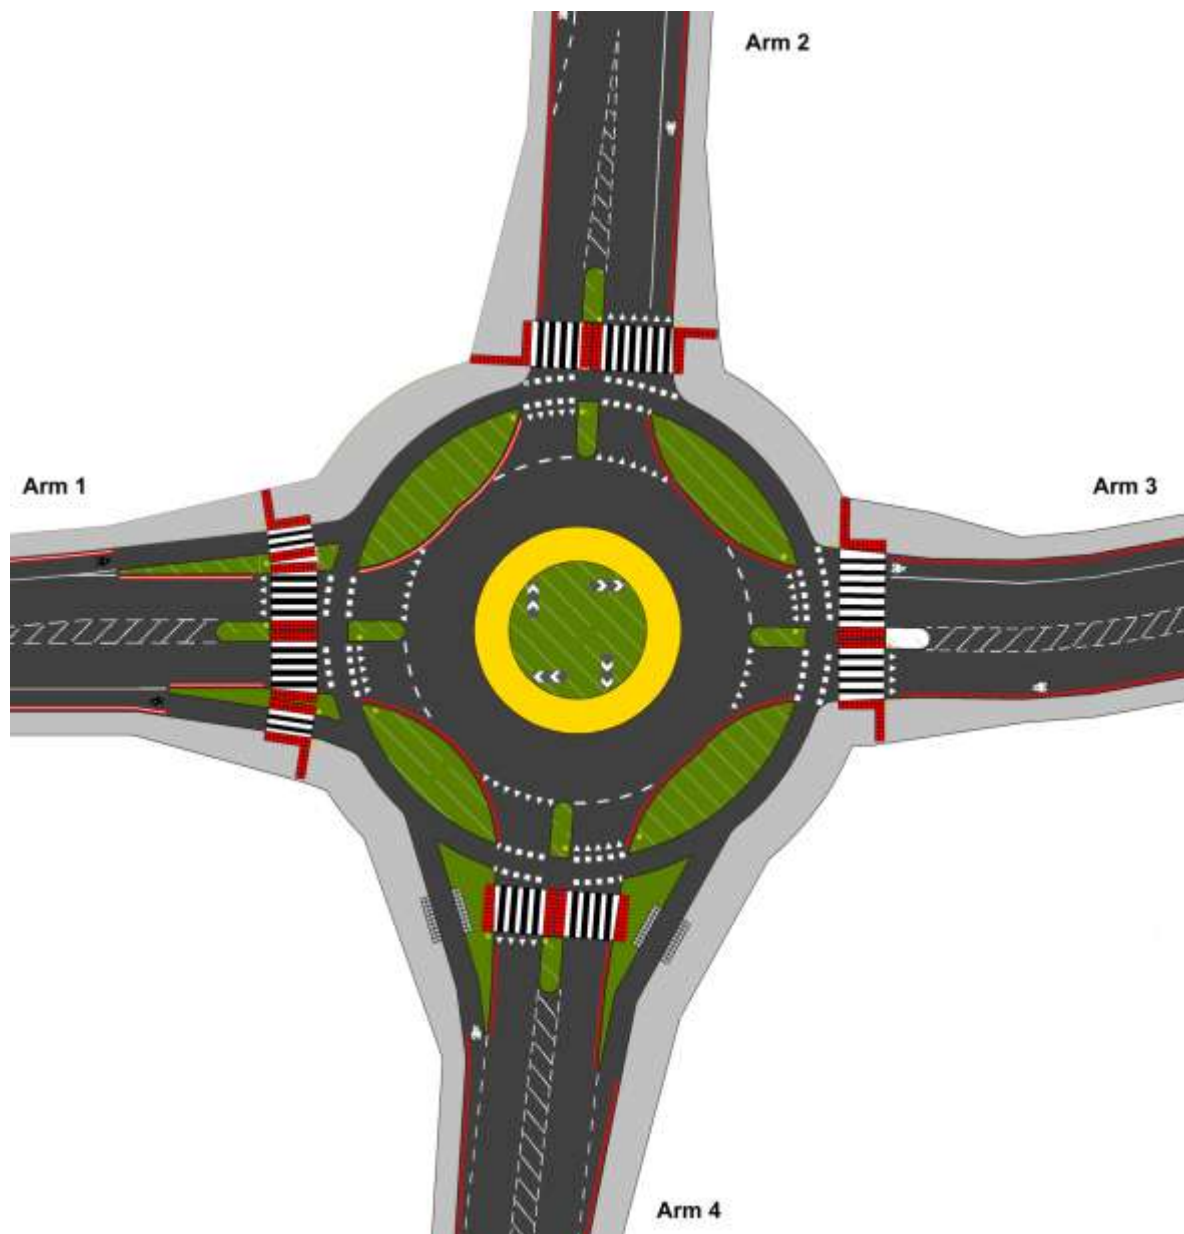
Layout of the Dutch-style Roundabout with Dutch road markings
